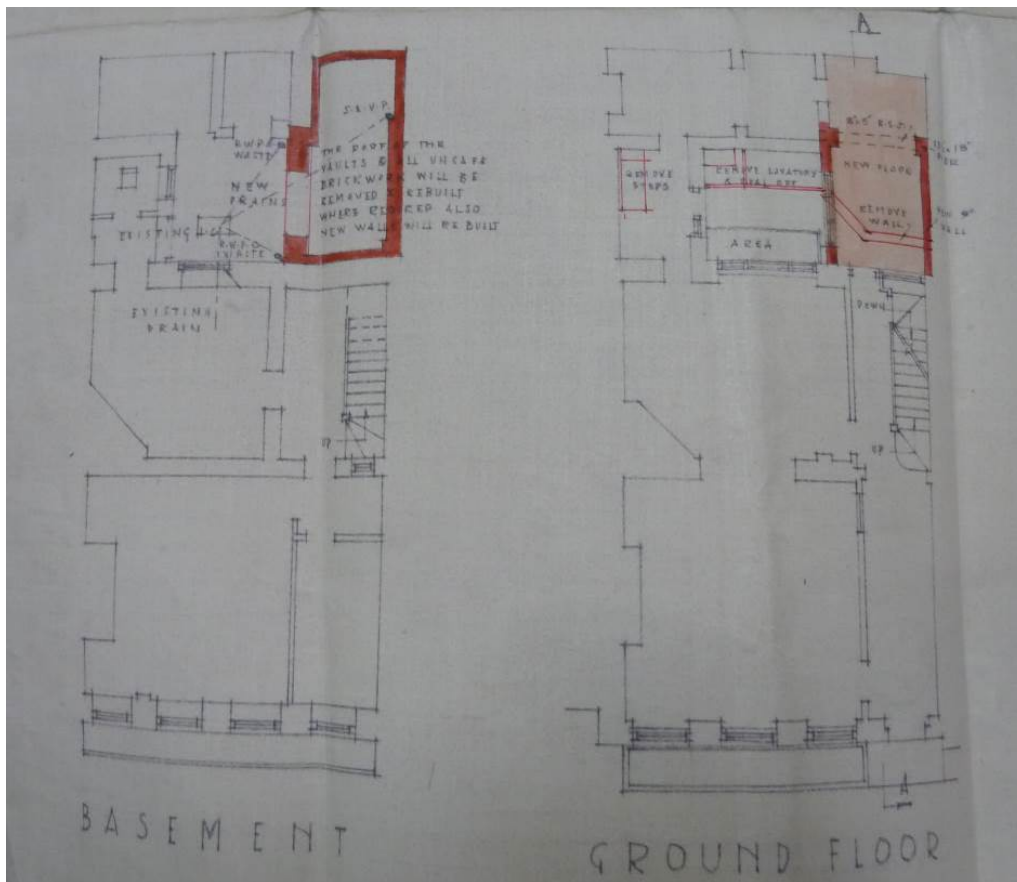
Proposed basement and ground floor plans, J. Mackie Murray ARIBA in conjunction with Lawrence Farman FRIBA, February 1947 (LB Camden, planning file)
